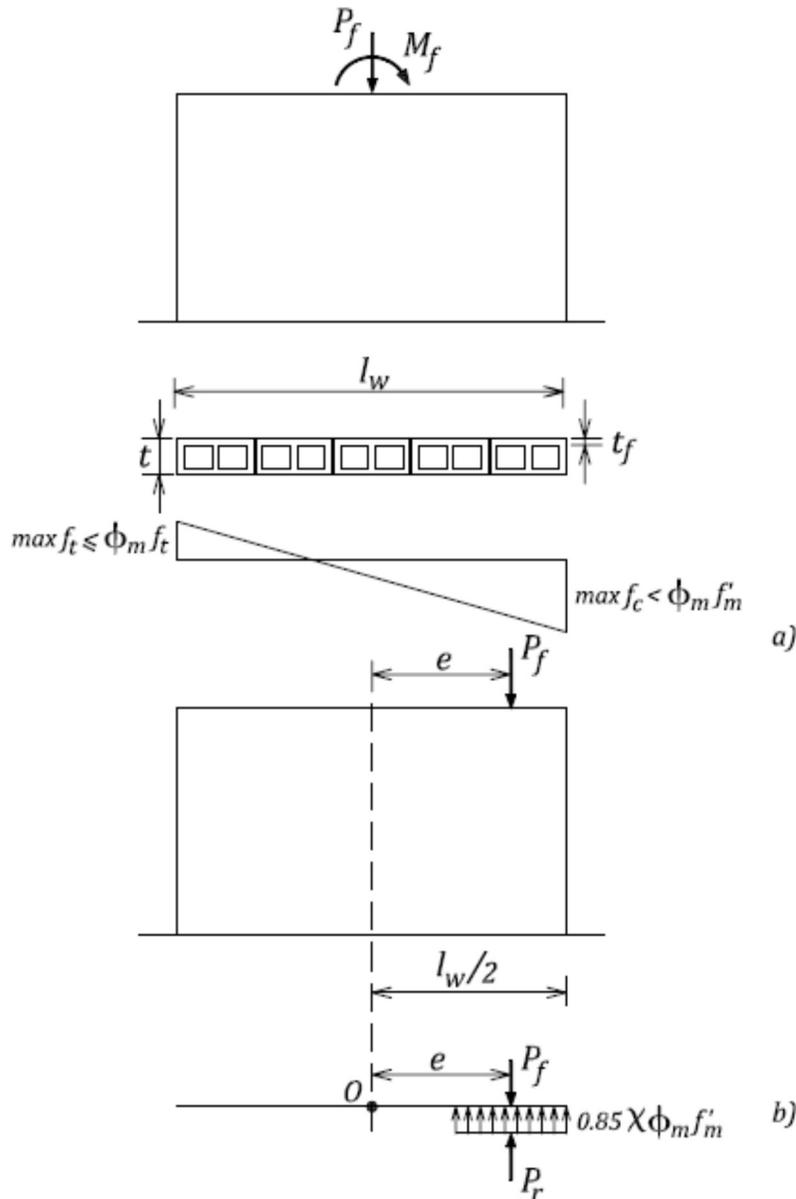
Stresses due to combined axial load and bending in an unreinforced masonry wall: a) uncracked wall; b) cracked wall.
